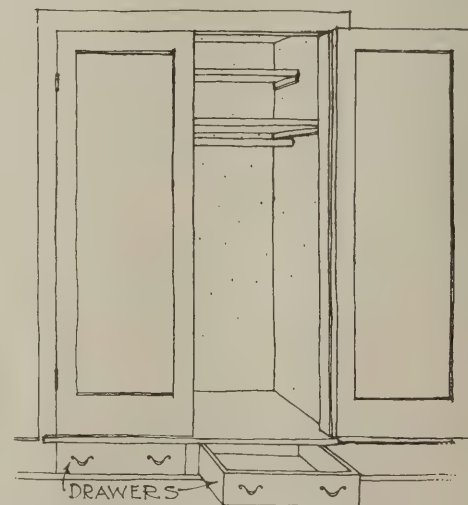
This Variation in Arrangement Raises the Floor of the Wardrobe to Escape Ground-dust
